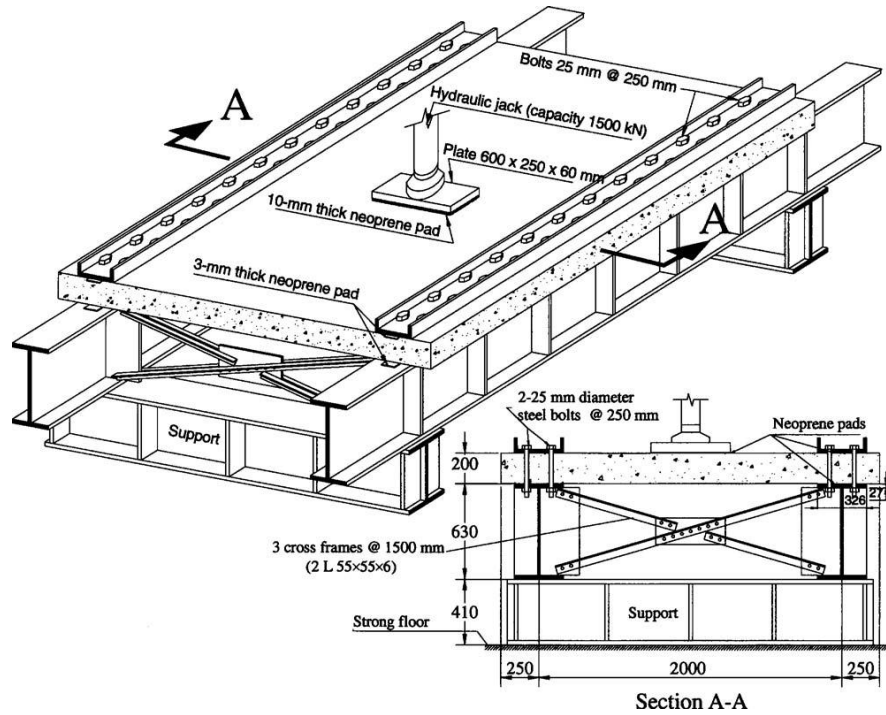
Isometric View and Cross Section of Testing Frame (El-Gamal et al., 2005)
